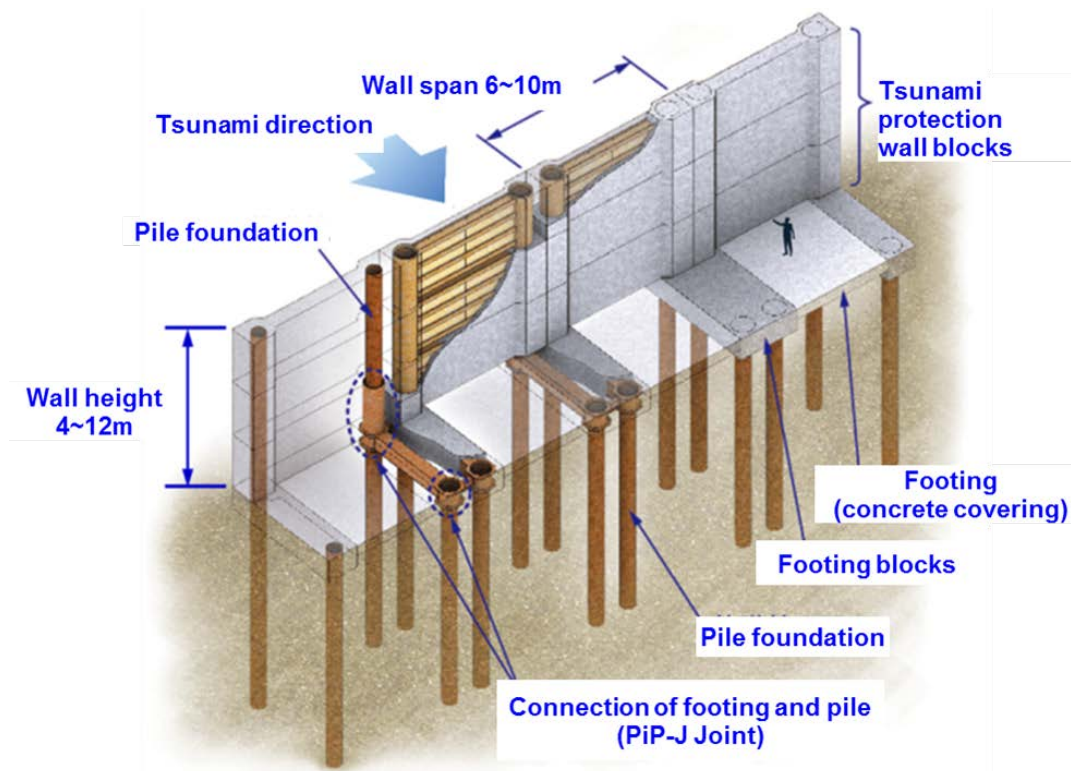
Schematic view of “Hybrid Tsunami Protection Wall”
